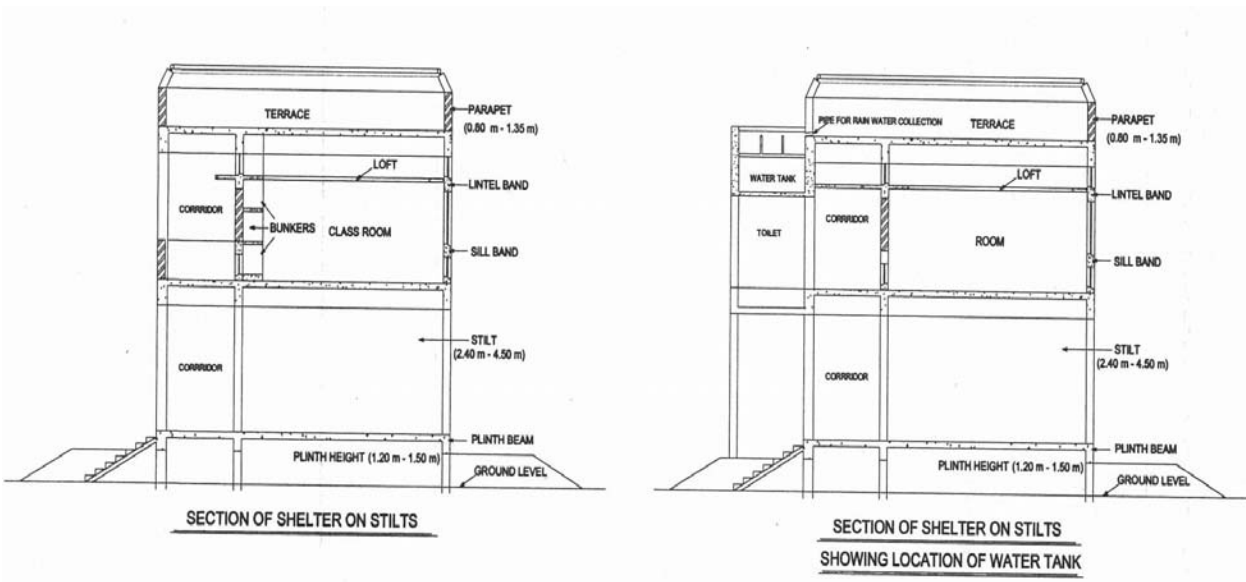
Section of Shelter on Stilts showing location of water tanks
